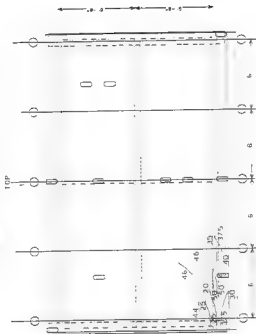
Top Cracking Pattern (First Bridge - Test No 7)
